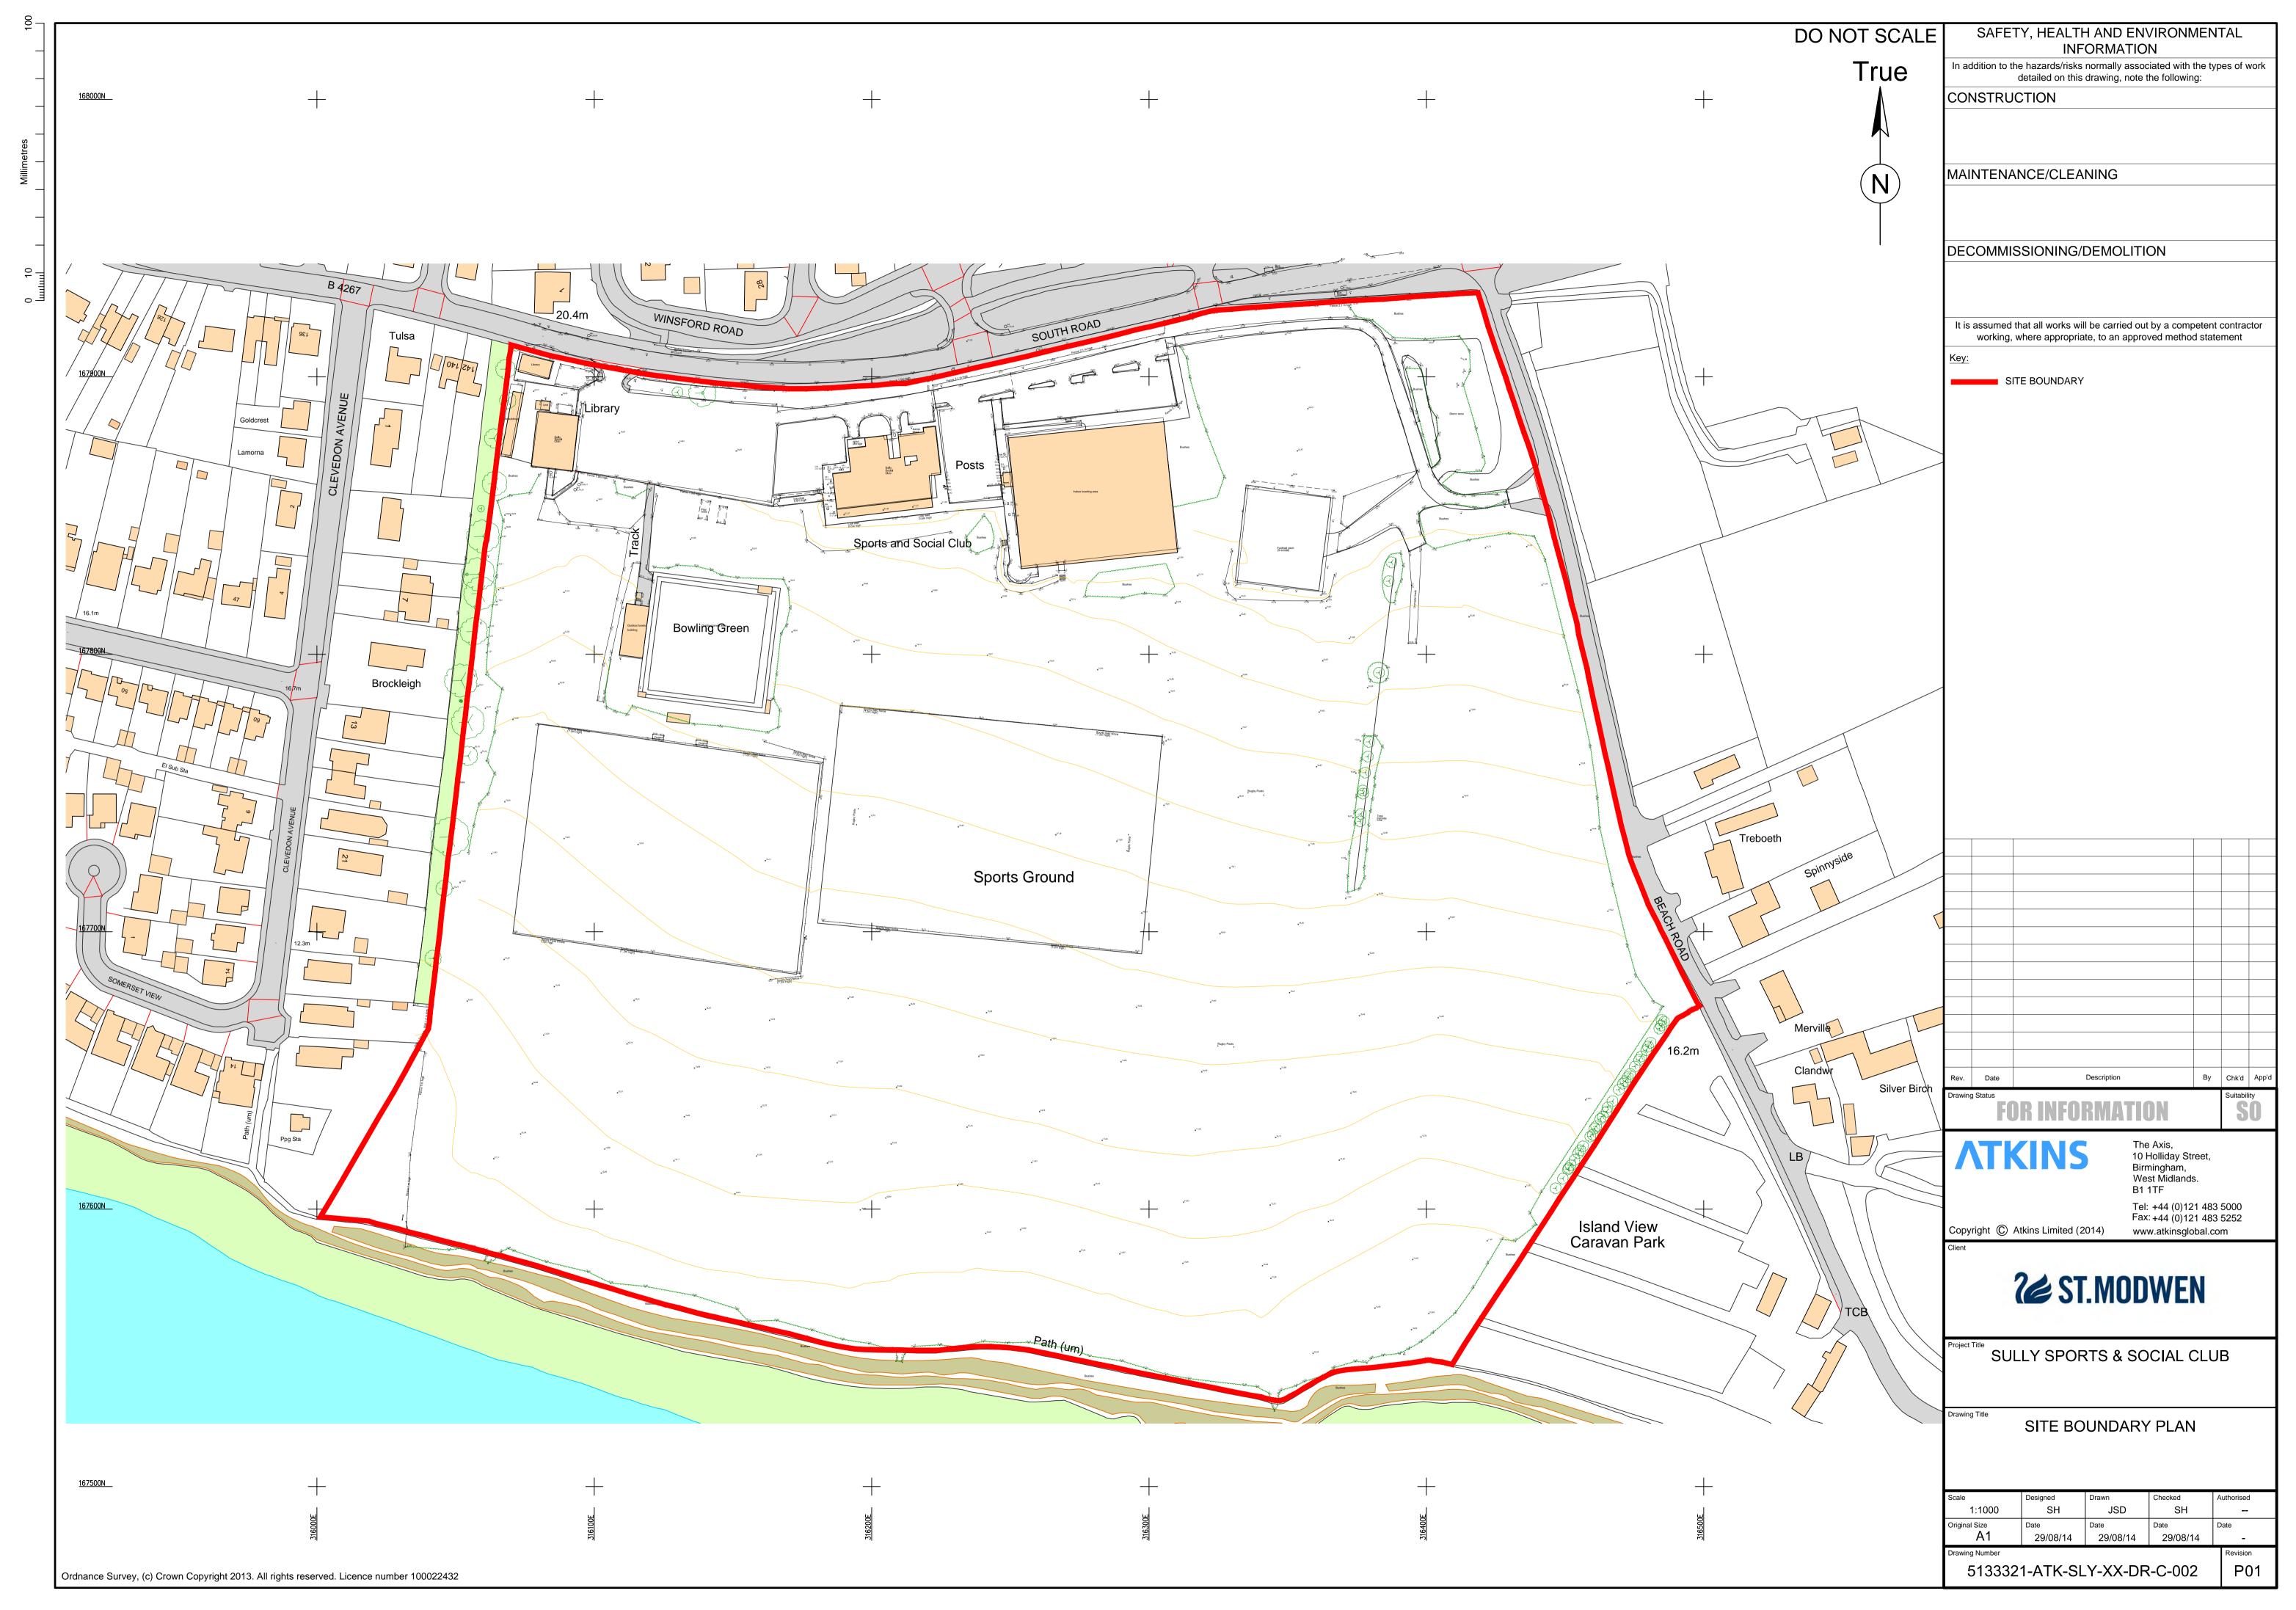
ATK-SLY-XX-DR-C-002 – Site Boundary
